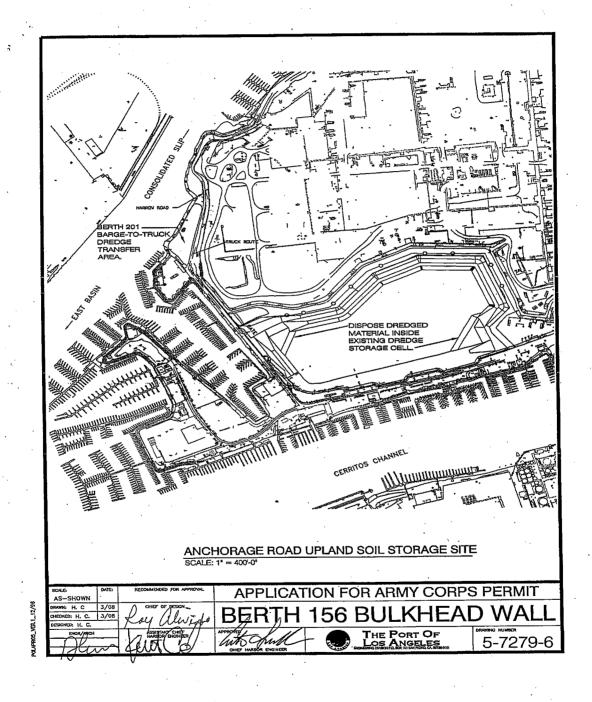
Location of disposal site (Anchorage Road Soil Storage Site).
